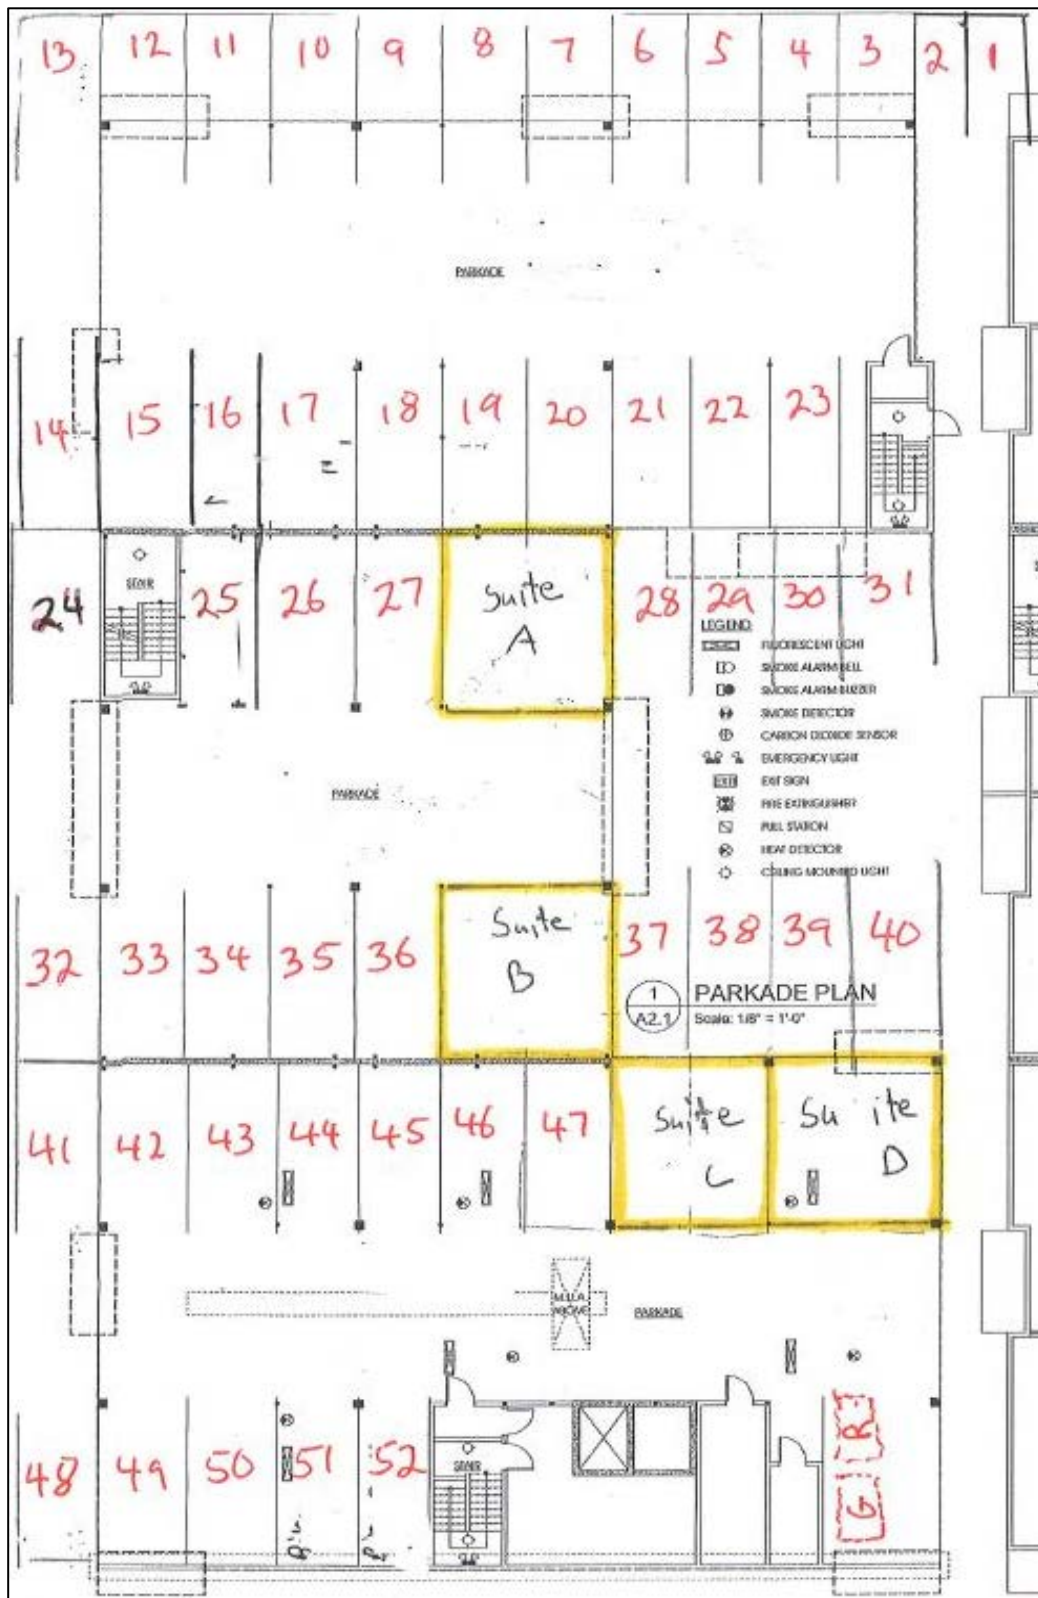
Proposed Site Plan showing conversion of parking spaces to suites
